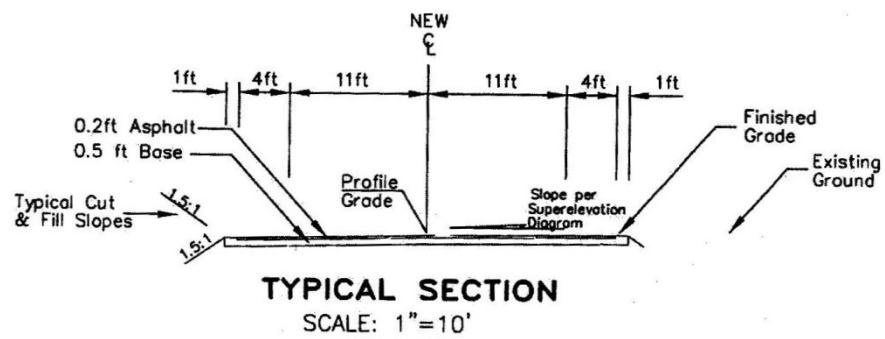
Sample cross section from the Red Cap Road horizontal realignment Project Study Report
